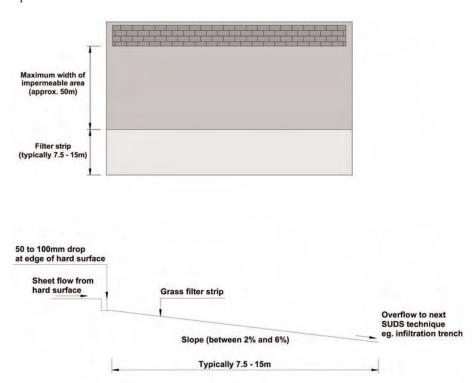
Plan view and elevation of filter strip (adapted from Wilson et al, 2004)
